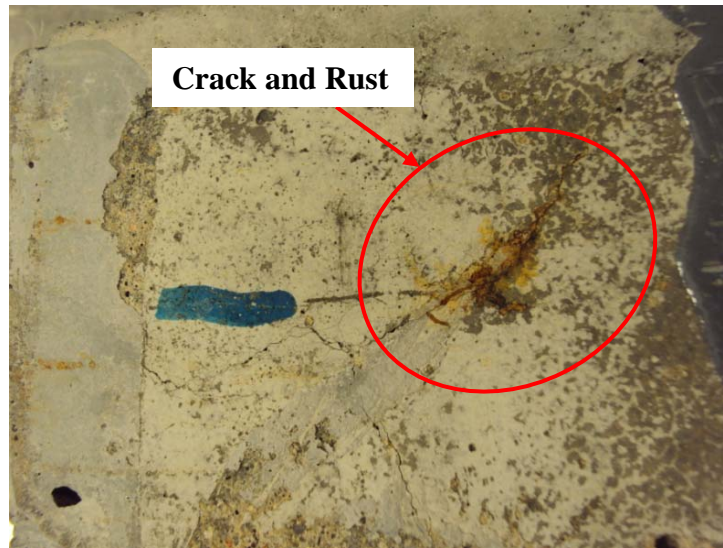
Rust and Crack in Corrosion Specimen (SP1-FRC-1)
